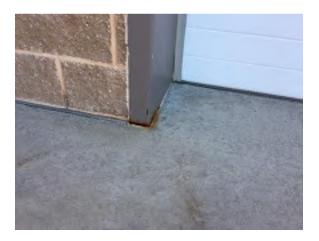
Overhead door jambs on 2012 addition beginning to rust.
